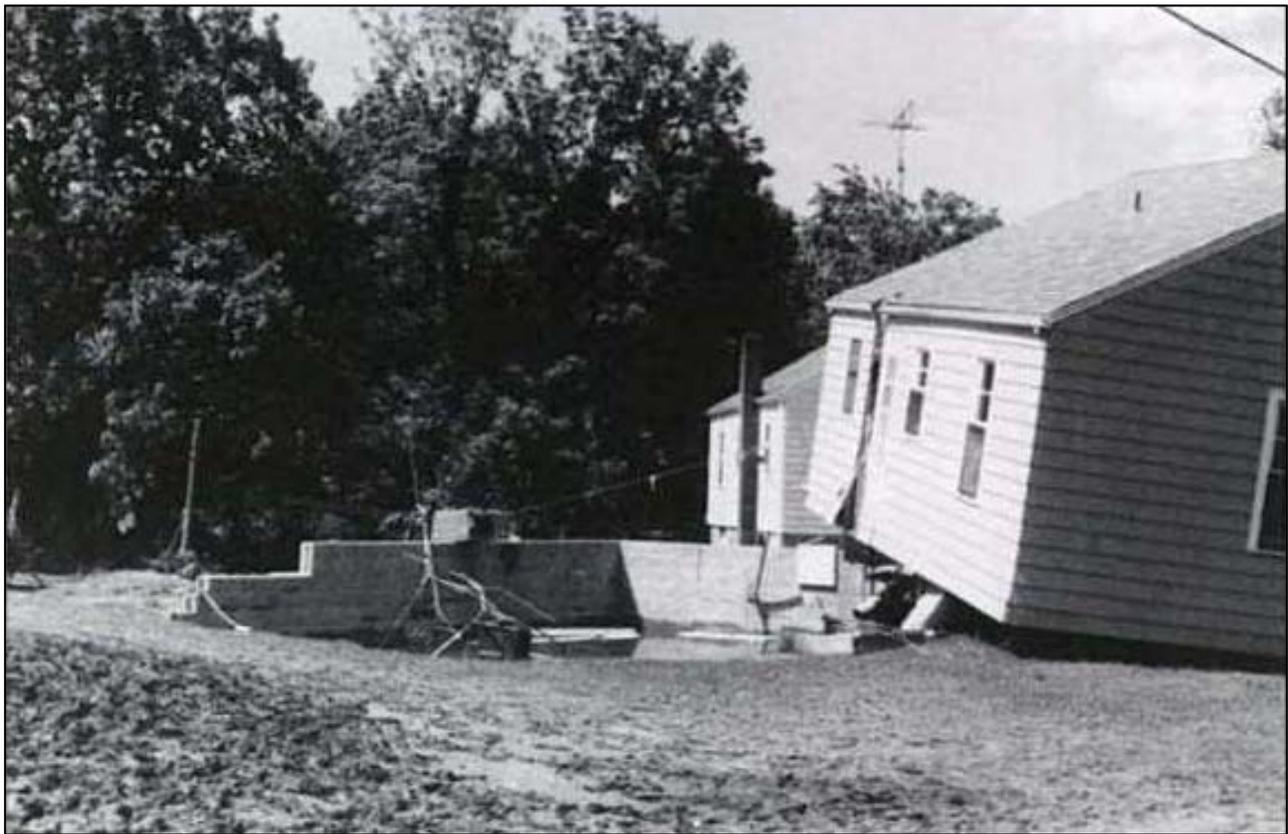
Photo showing houses lifted off their foundations at Ivoryton, but not destroyed.
